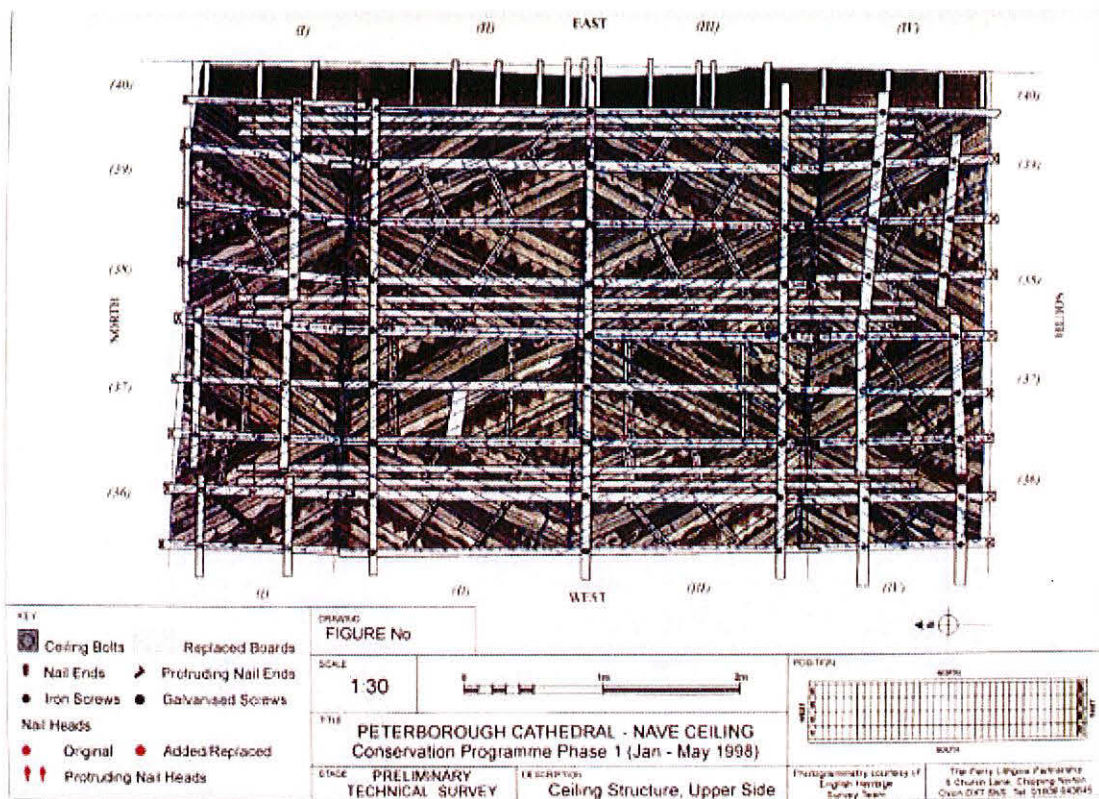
Extract from preliminary technical survey showing upper ceiling structure overlaid onto underlying ceiling detail
